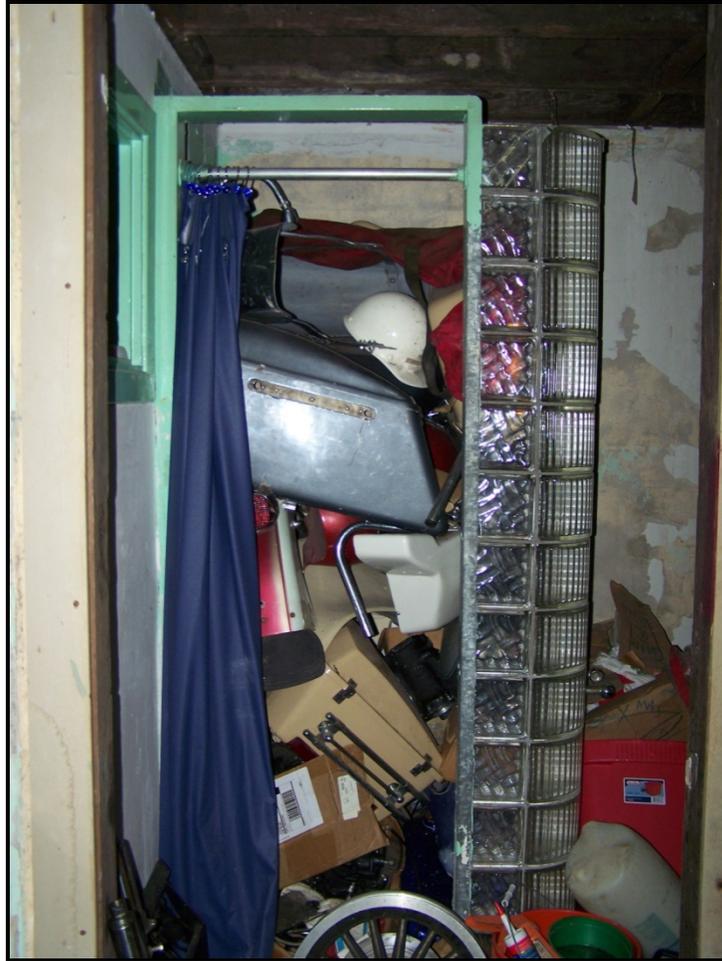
Donlin House Pool Shower, View Looking Southeast.
